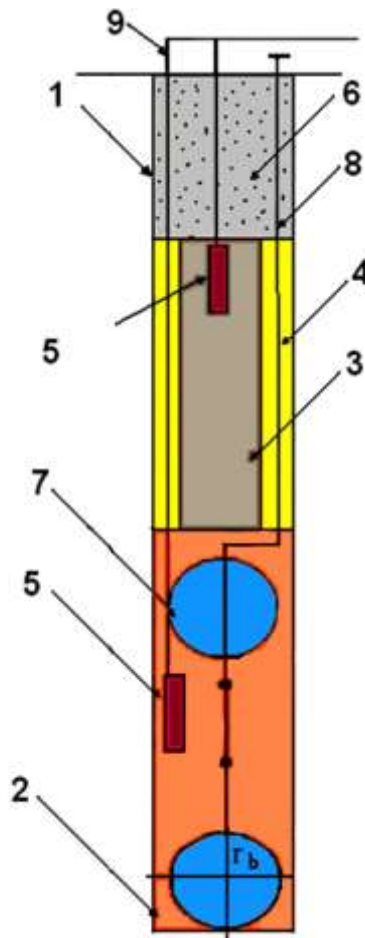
Structure of the borehole multicharges variable diameter: 1 – borehole; 2 – mixed explosive charge; 3 – conversion explosive section; 4 – pyroxylin powder; 5 – primed blasting cartridge; 6 – stemming; 7 – spherical cavities; 8 – binder for connection of spherical cavities; 9 – initiation “Impulse” non-electric system
